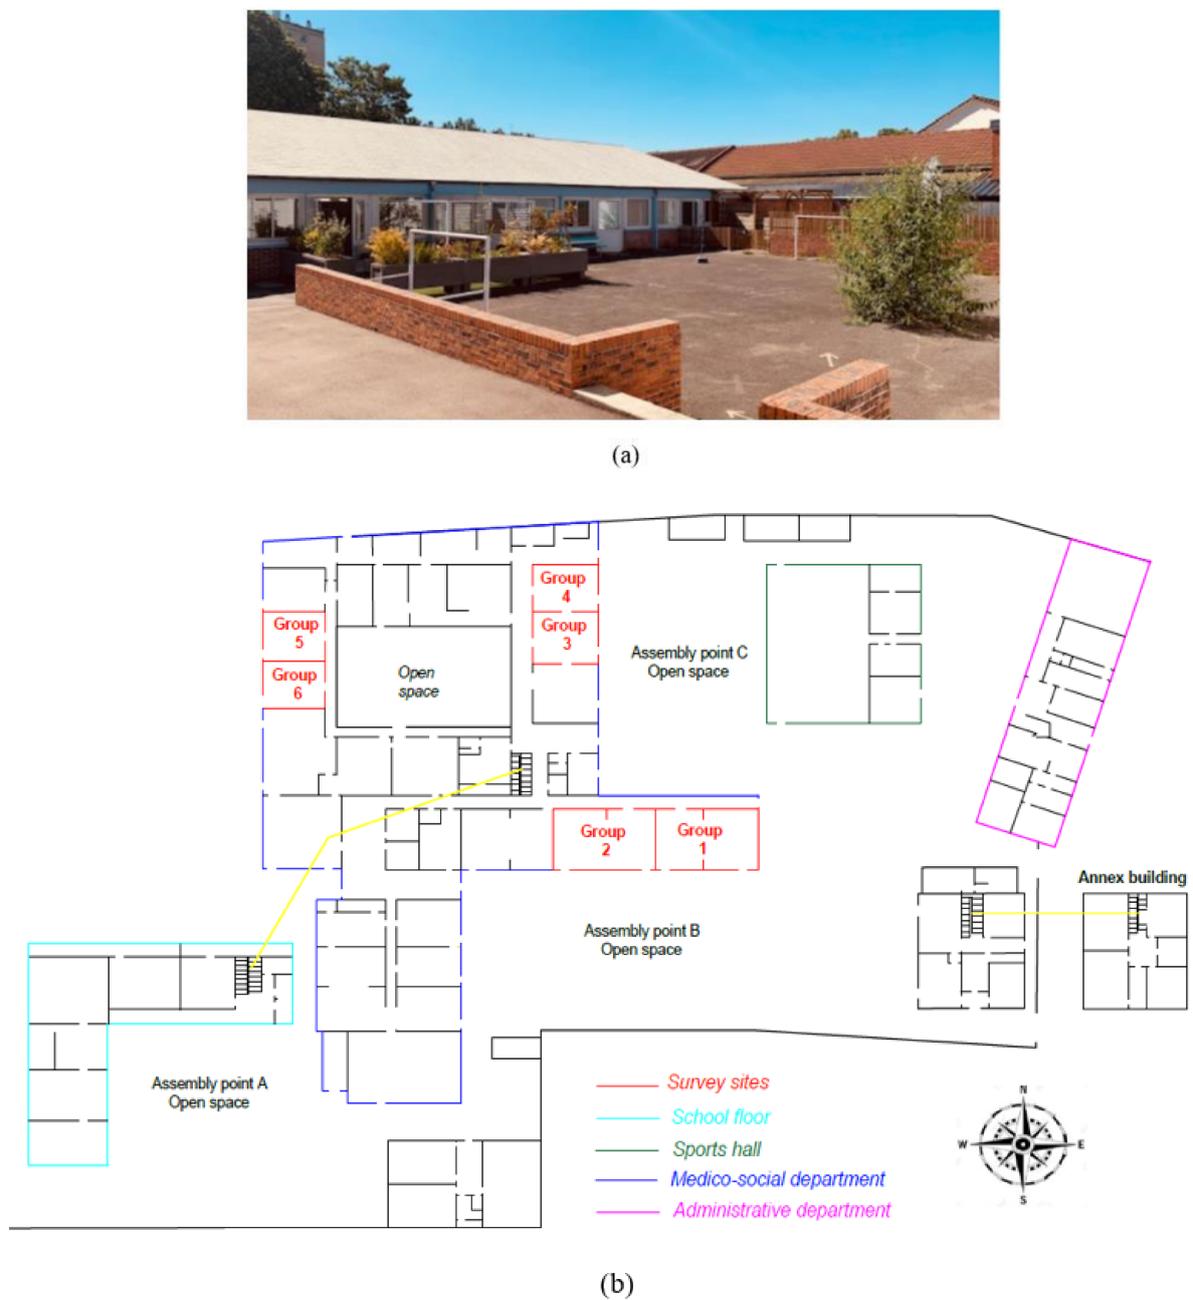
Surveyed buildings: (a) outside view of the medico-social buildings and (b) plan of the buildings.
